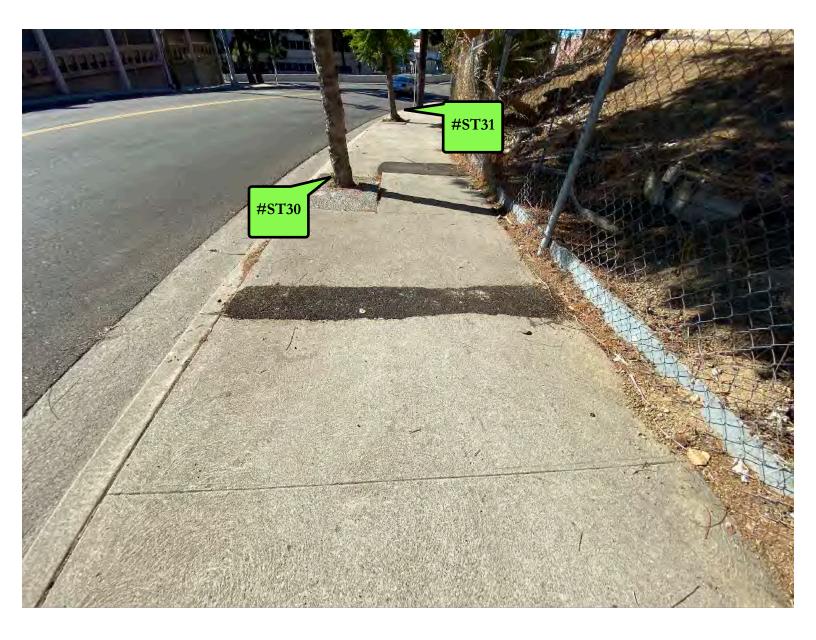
Street Trees #ST30 (front w/ sidewalk lifting) and #ST31 (rear) - both trees to be retained and protected in place.
